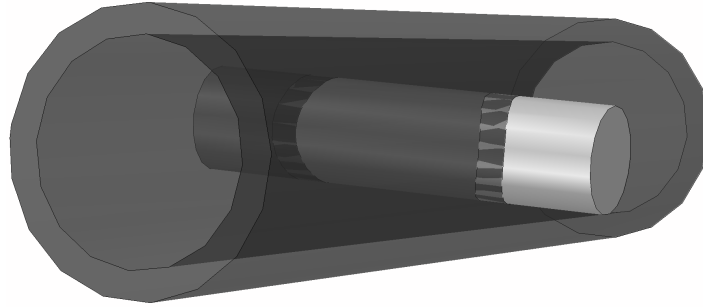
Illustration of design proposal for connection element. The sections in transparent black (blade beam and compression bars) are made of FRC and the grey cylinder (rod-connection) is made of steel.
